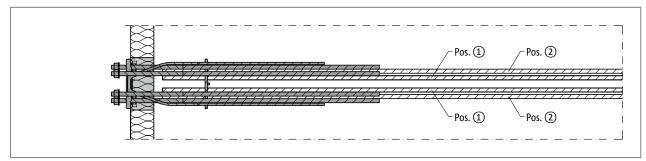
Schöck Isokorb® T type SK-MM1: On-site reinforcement: Plan view
